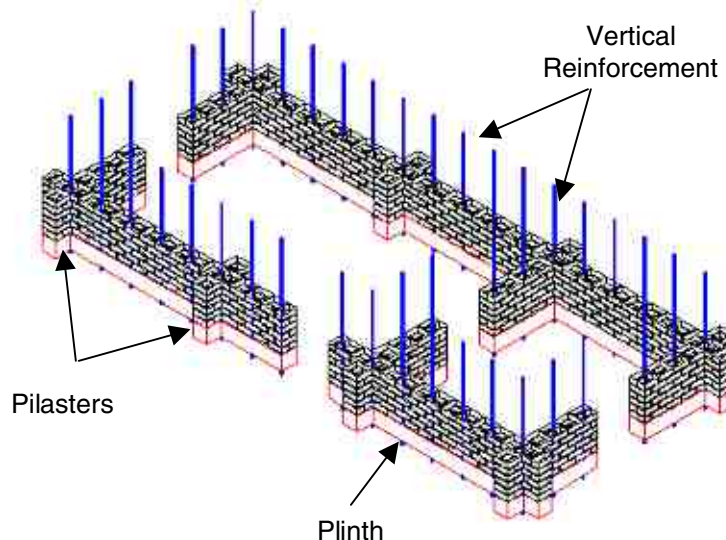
Preliminary design of child-care centre showing plinth, pilasters, door openings and vertical reinforcement (the internal wall was removed in subsequent versions).
